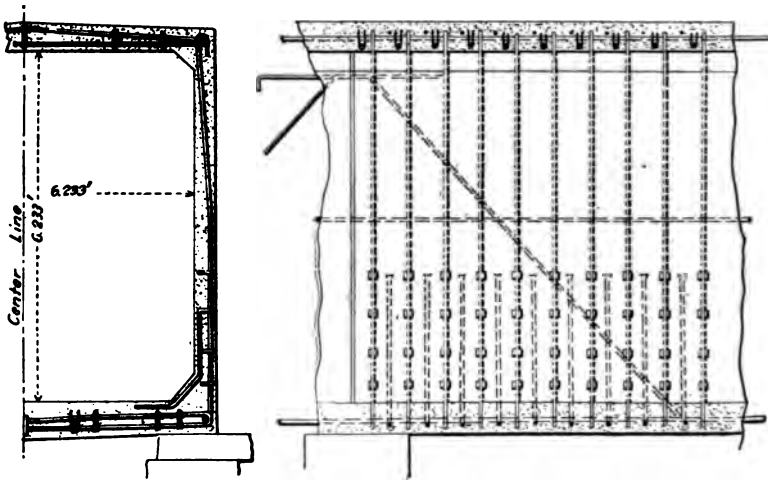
Aqueduct for Simplon Tunnel Water Power Plant.
